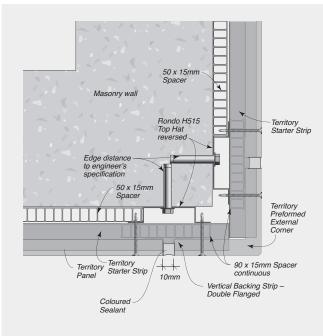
External Corner Detail – with Aluminium External Corner
